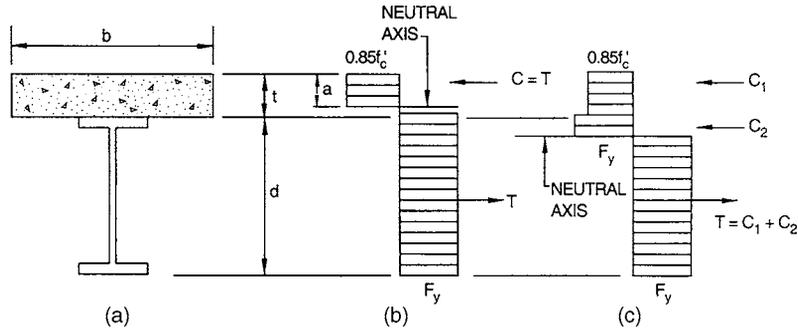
Plastic distribution of stresses in a composite beam in the positive-moment region. (a) Structural steel beam connected to concrete slab for composite action. (b) Stress distribution when neutral axis is in the slab. (c) Stress distribution when neutral axis is in the web.
